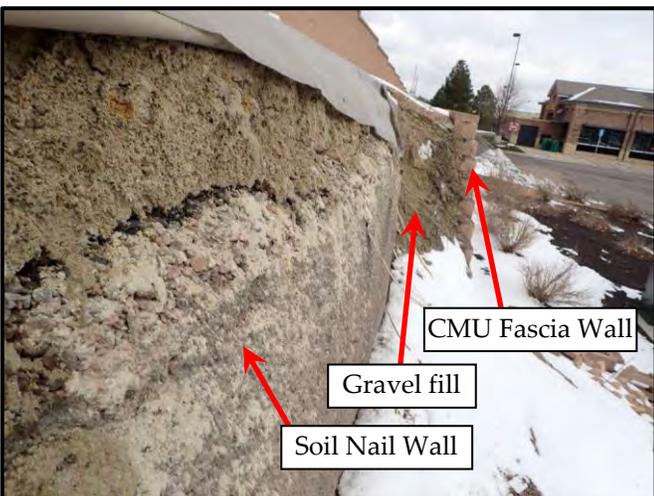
Lateral view of soil nail wall, gravel fill, and CMU fascia wall
